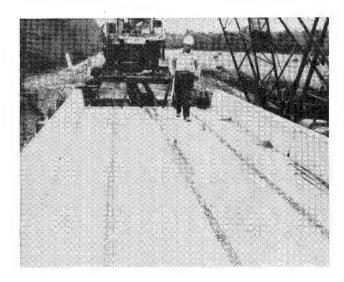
Shear keys between box girders are filled with pea gravel and epoxy (from Marianos 1991)
